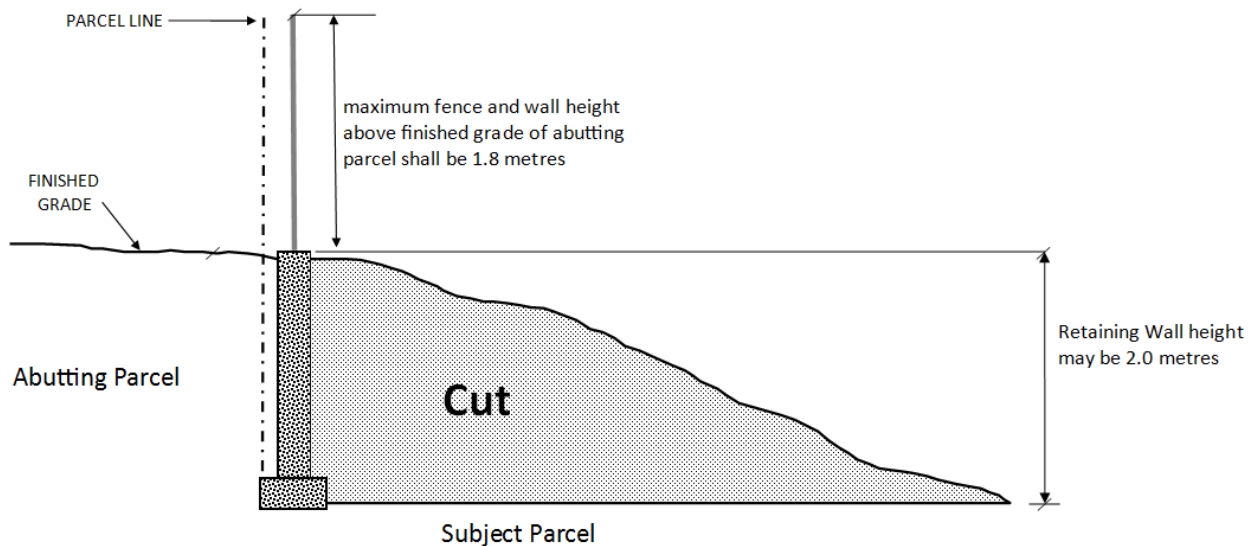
Retaining Wall in a Setback Illustration
